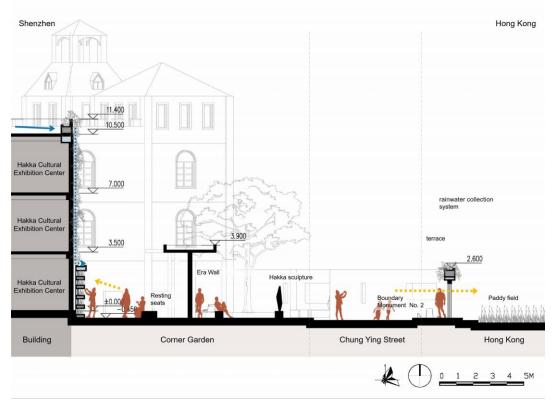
Section of Corner Garden (Source: Drawn by the Author)
